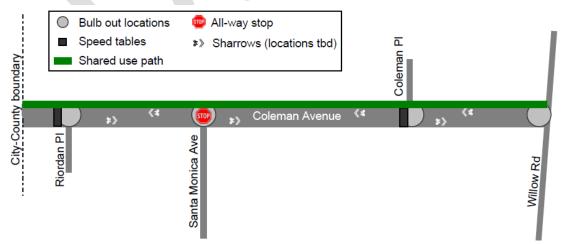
Coleman Avenue (City of Menlo Park) Preferred Long-term Alternative Plan View Schematic Bicycle Boulevard with Shared Use Pathway and Parking on One Side
